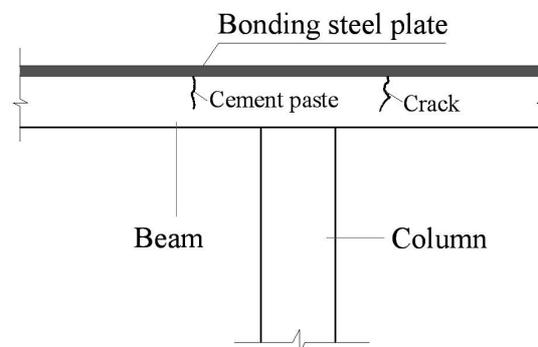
Crack repairing and beam strengthened by bonding steel plate
